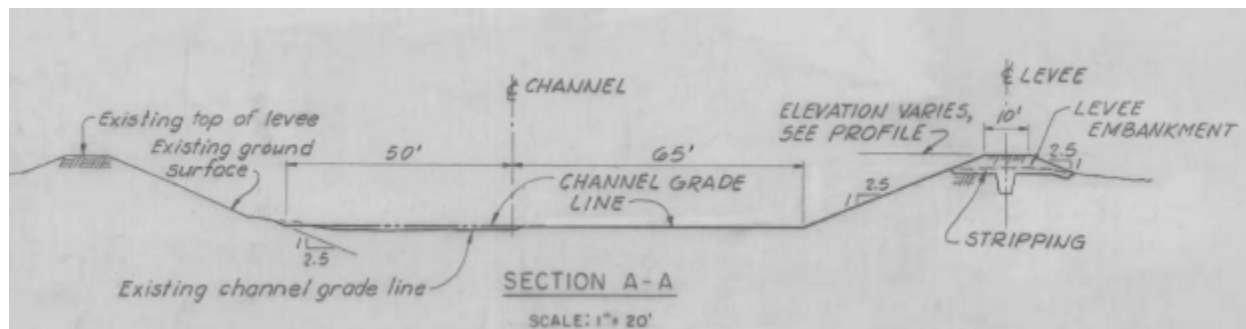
Channel Cross Section Station 150 Feet Upstream of Concrete Drop Structure
